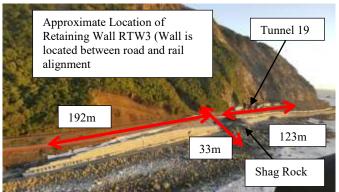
New Site 6 seawall & RTW 3 Bored Pile Retaining Wall (under construction)
